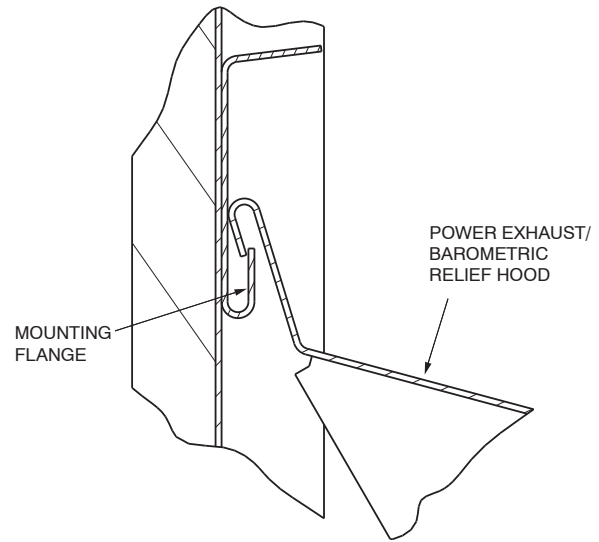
Barometric Relief/Power Exhaust Hood Flange
